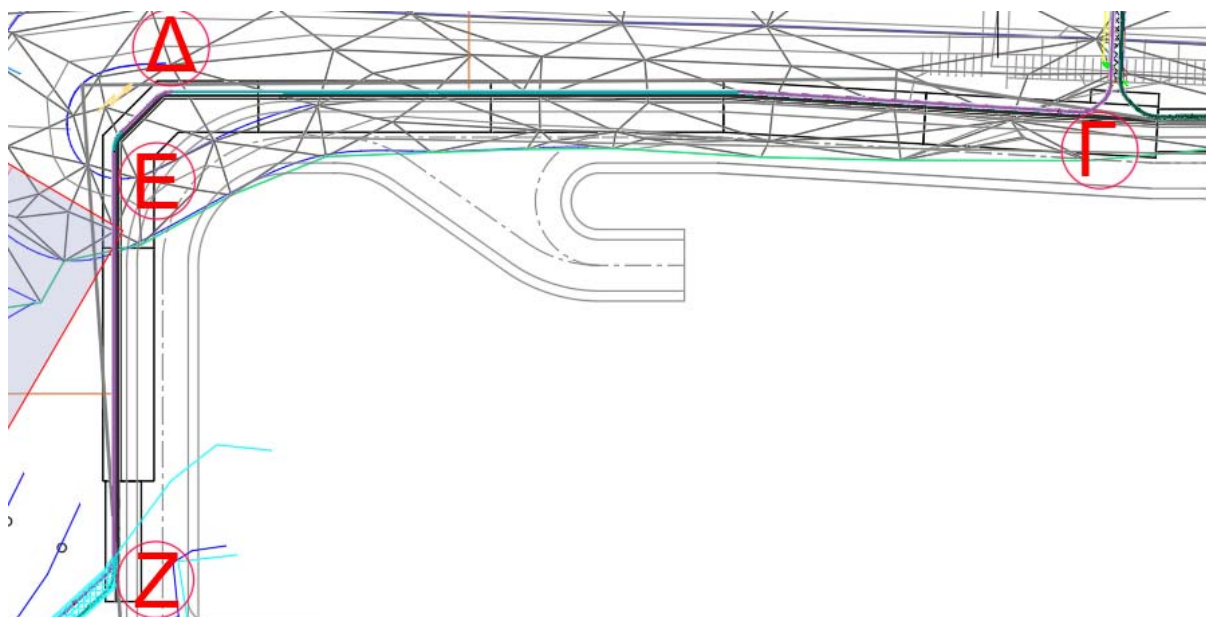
Cable systems on the support walls of the new Station 826MW.
